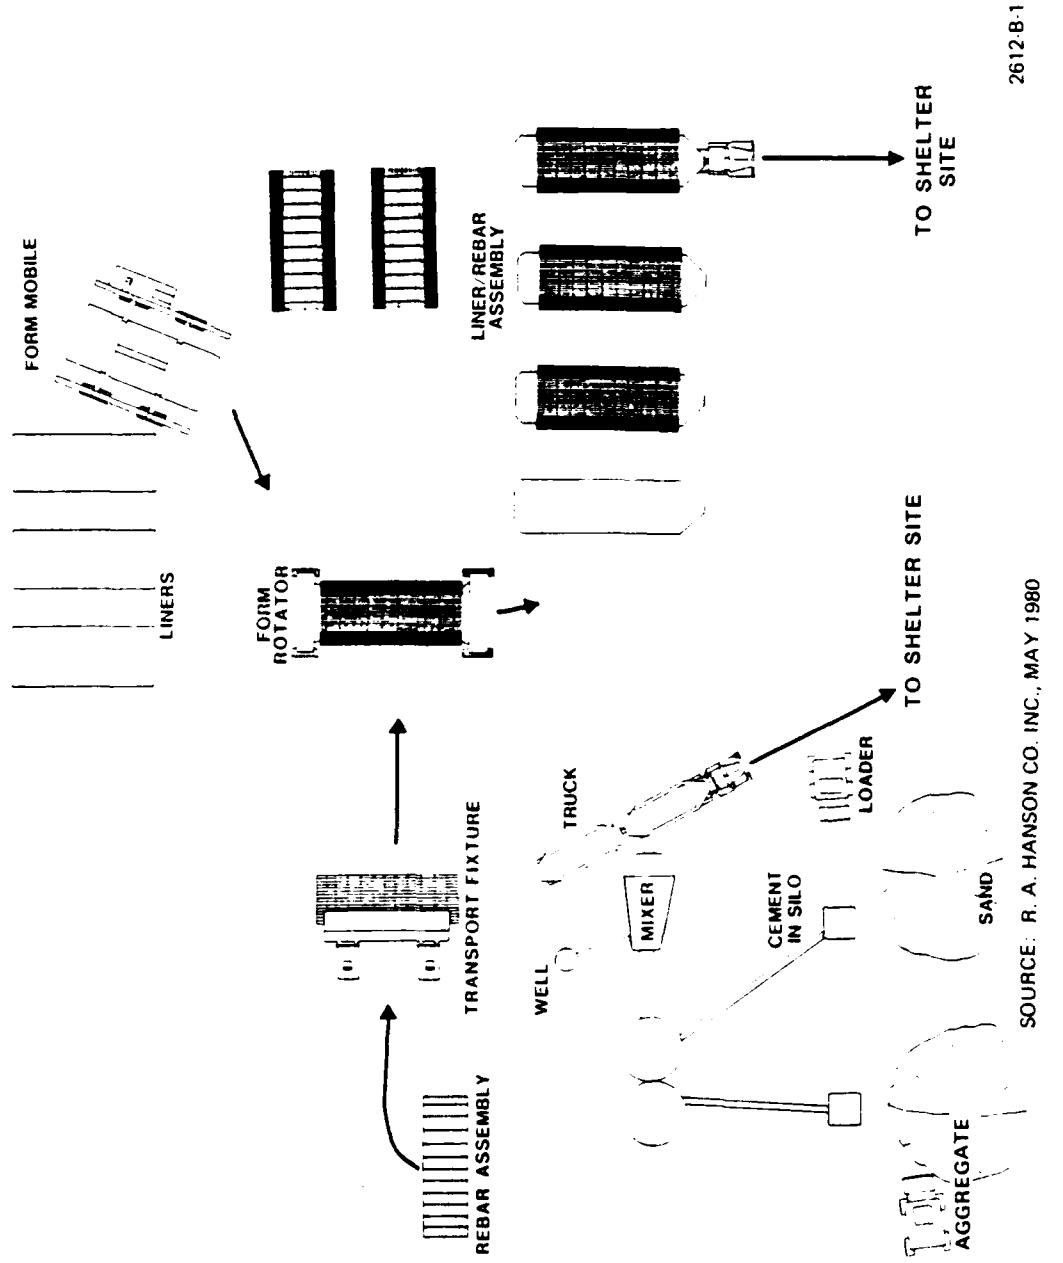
Mechanized cast-in-place concrete plant.
